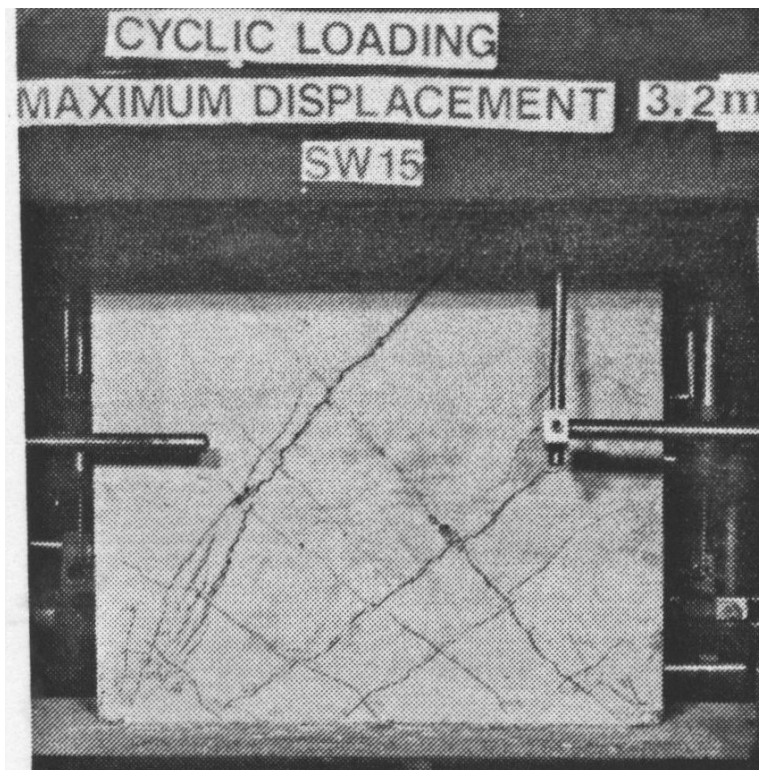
Condition of wall SW15 at 0.65% drift [Lopes and Elnashai (1991)]
